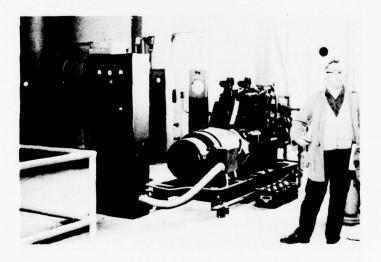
Intake and Gate House - Floor at elevation 750.5, Emergency motor generator set
